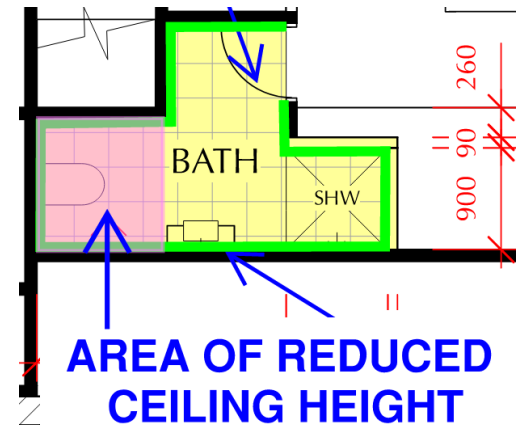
and Figure 4 – Water Closet located under stair does not achieve ceiling height of at least 1.2m
